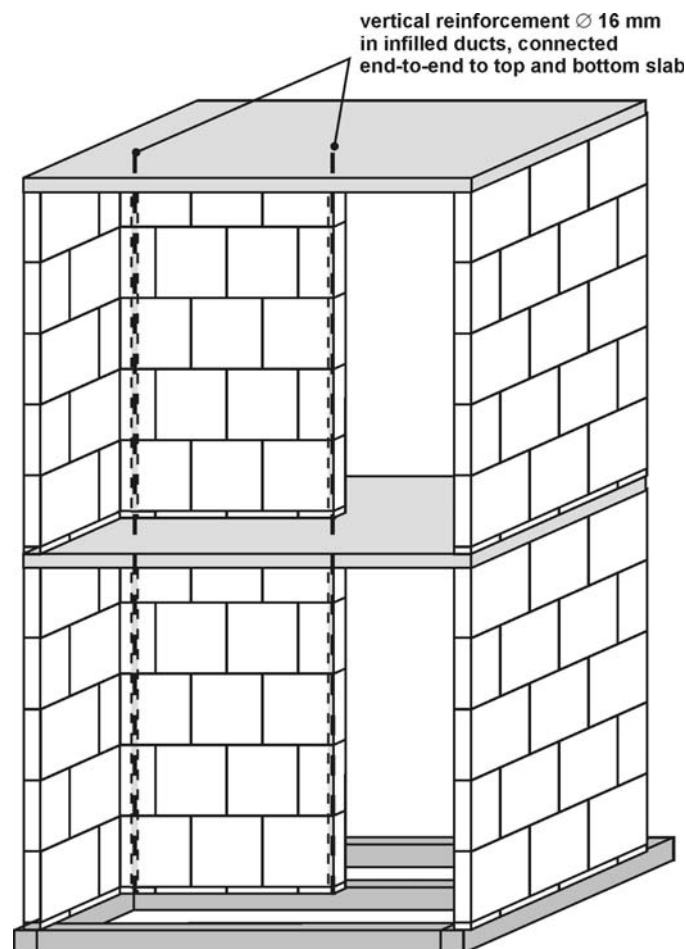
Configuration of vertical reinforcement exemplary shown for Series A3 (calcium silicate units KS XL-RE 20-1,8
